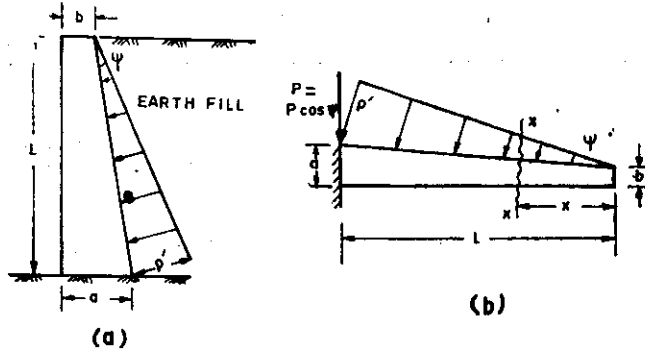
Cantilever Retaining Wall-Cantilever Beam.
